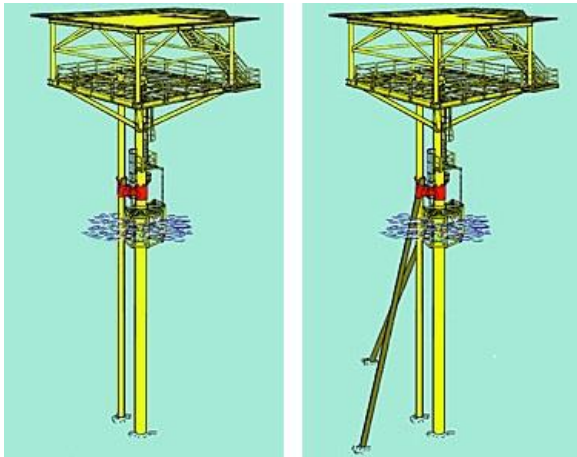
Freestanding (Left) and braced caisson (Right) [33]
